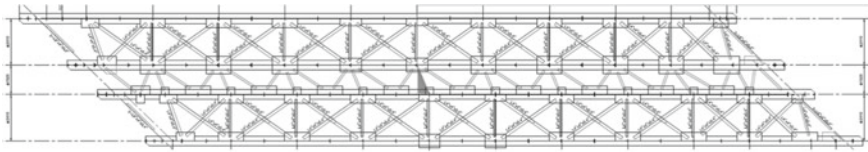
Plan view of span 2 (Span 4 has a similar configuration)
